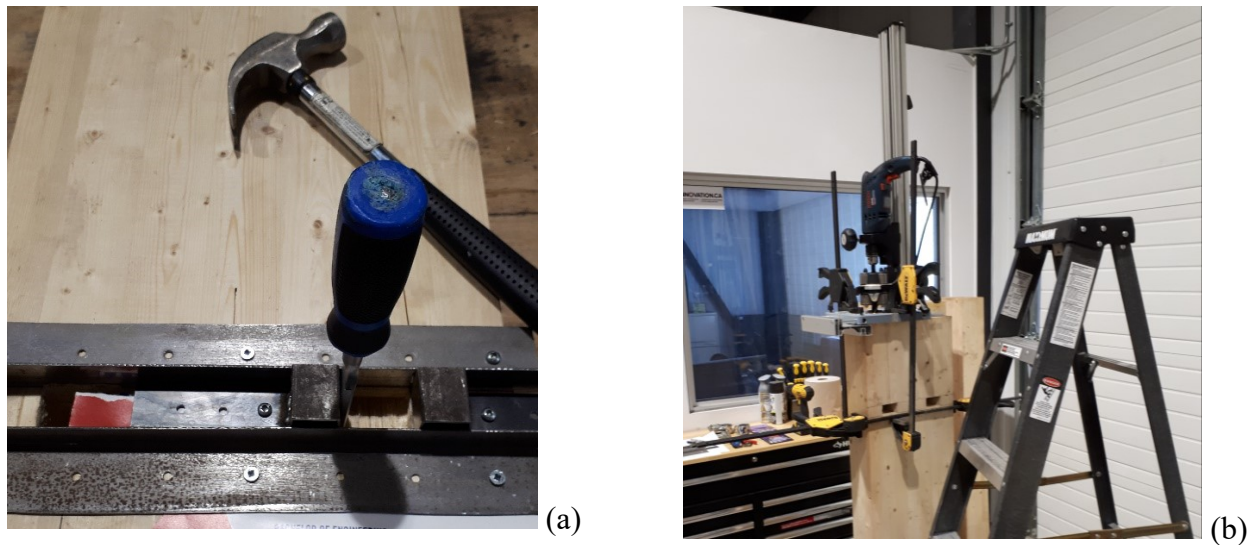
Preparation of beam: (a) A beam section being chiselled; (b) A beam section being drilled.
